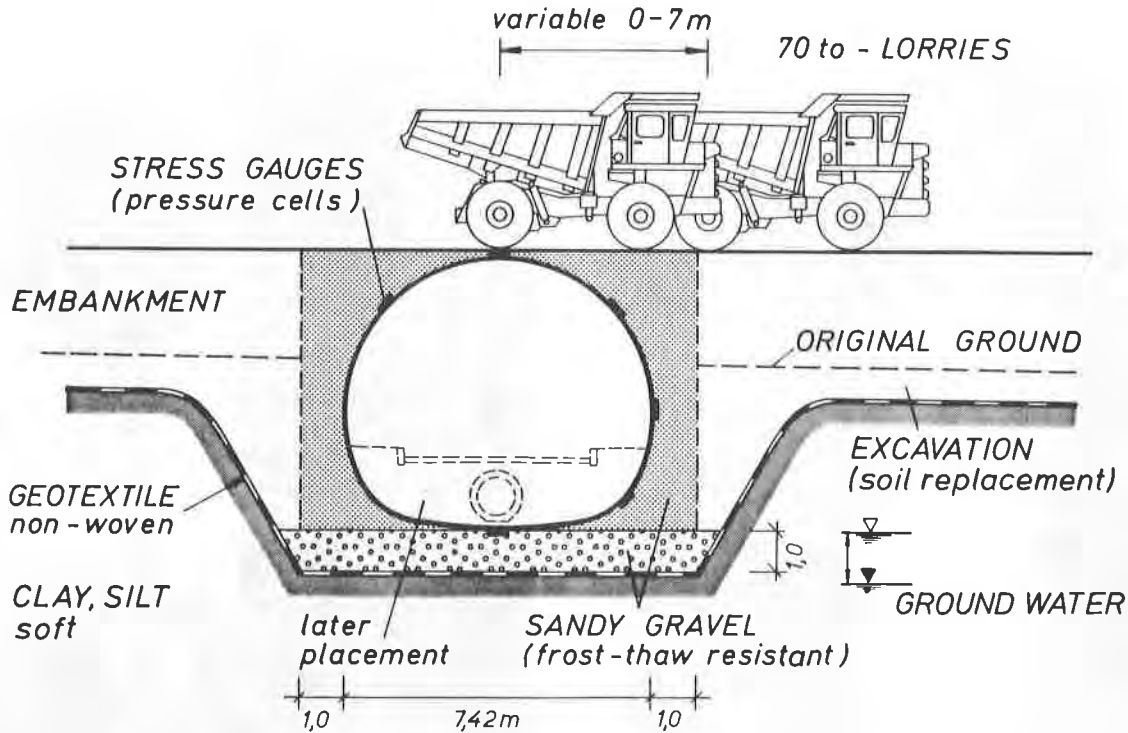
Steel culvert (length $l = 40$ m) onto soft subsoil and geotextile: load tests with 70 to - trucks (one lorry behind another).
